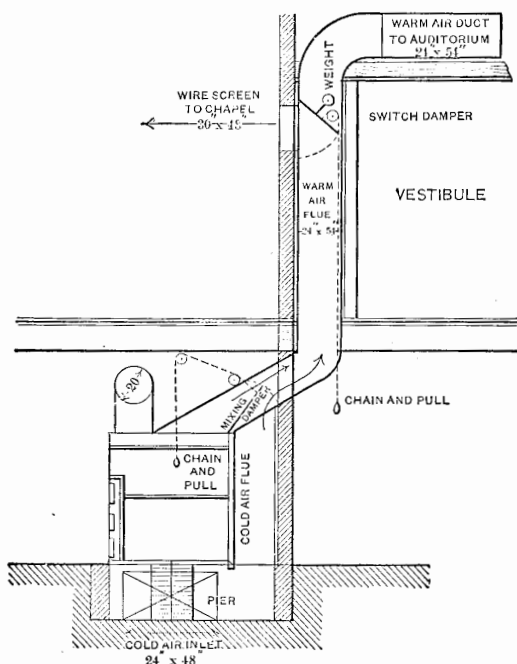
Section at B B, Showing Mixing Damper and Switch Damper.
